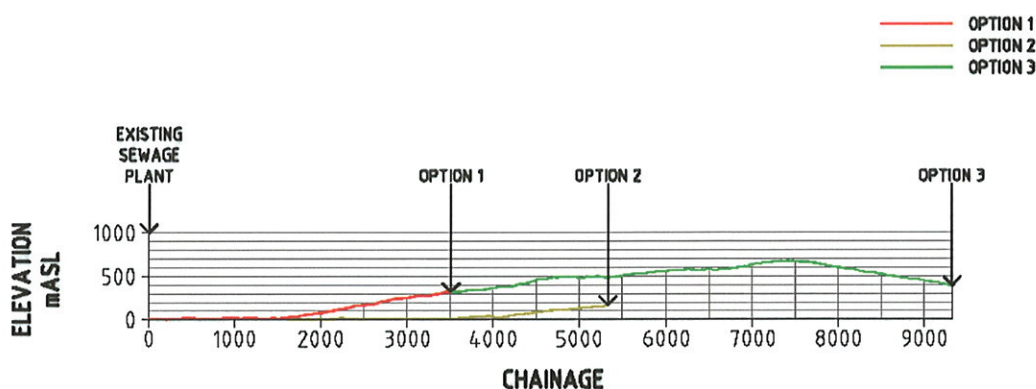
Long sections of pipe routes to potential land disposal areas
